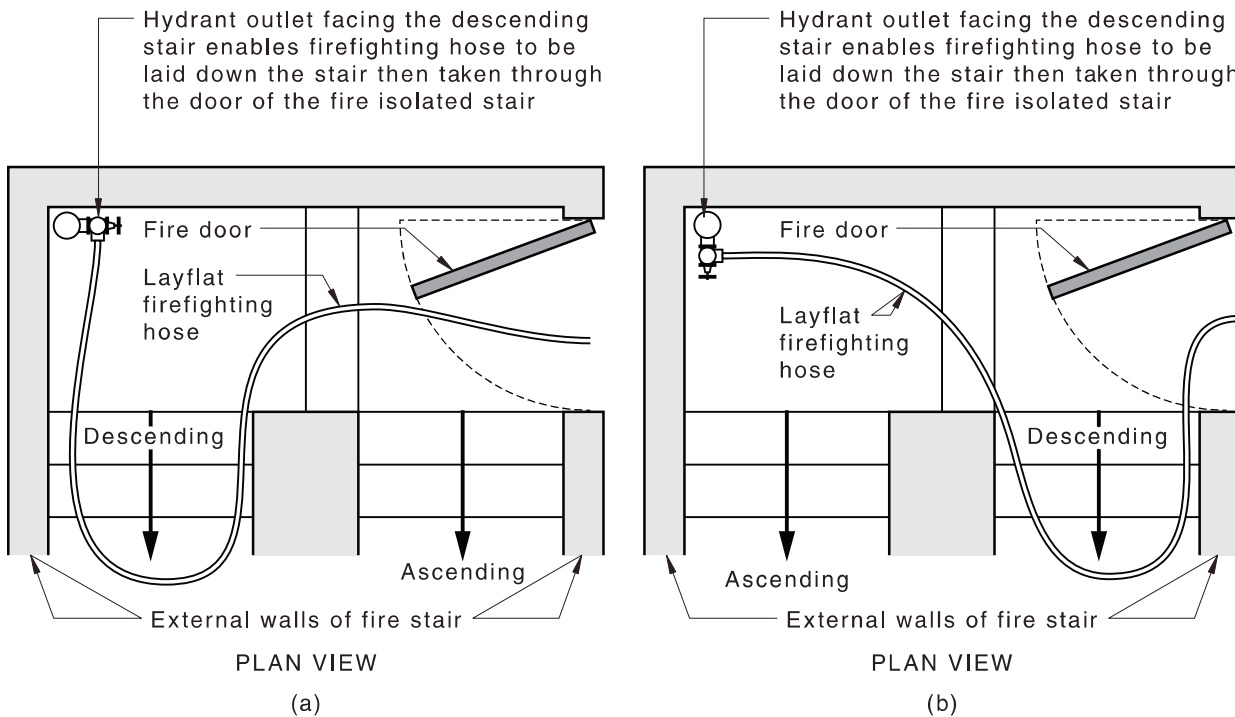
(D) — Orientation of fire hydrant outlets in fire-isolated stairs
